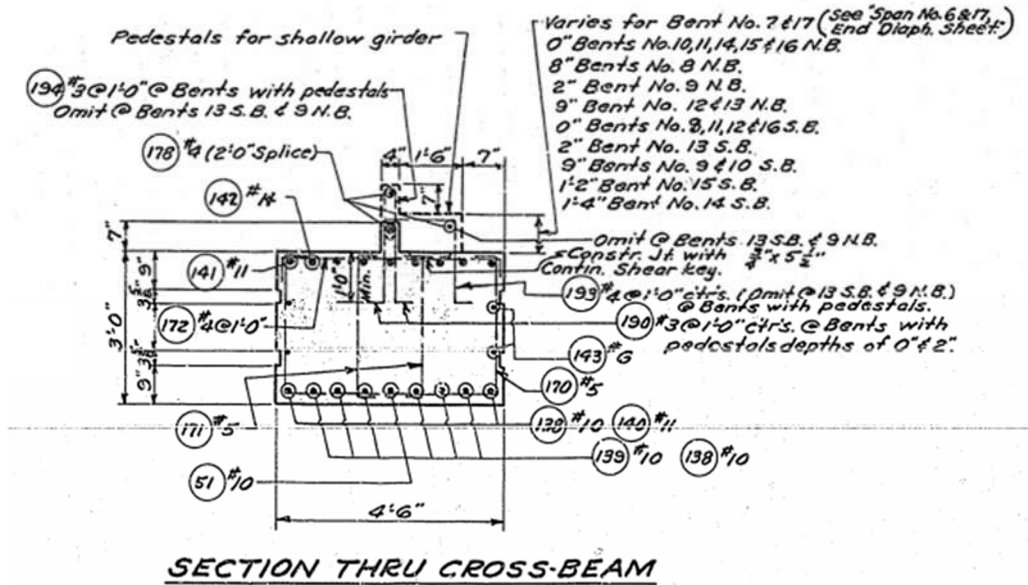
Cap beam cross-section for Typical Bent (Ravenna)
